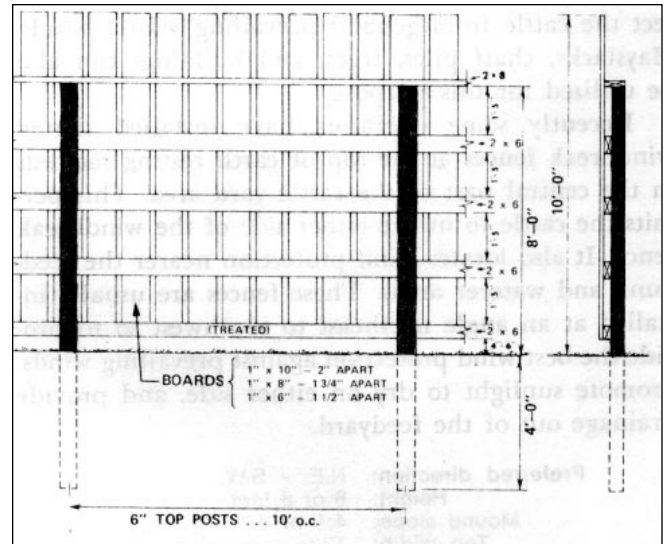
General construction recommendations for slatted board fence construction. Locate cattle next to side with vertical boards or install "rub-rails" if cattle will have access to each side of fence.
